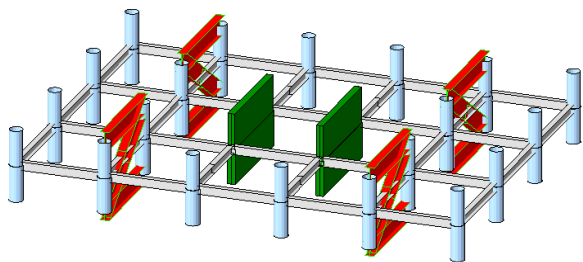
Layout type 1 of offset outrigger system(Outrigger is installed in line 2 and 5)
